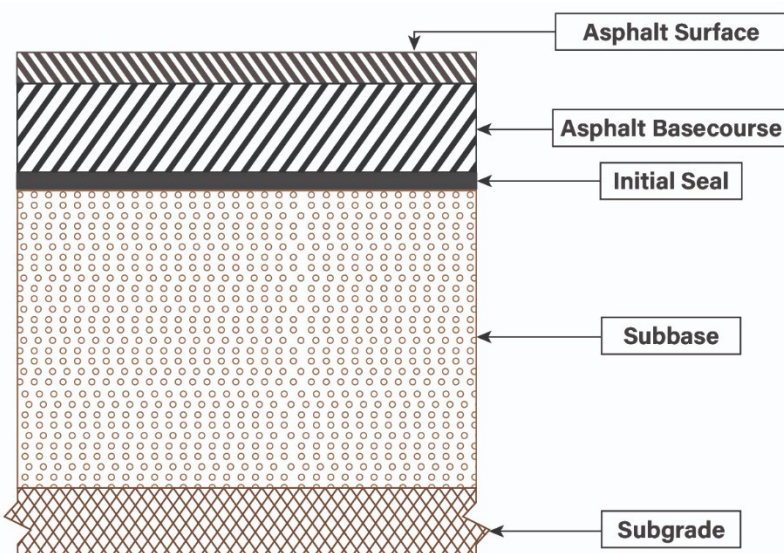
Example pavement structures – asphalt basecourse (see Section 3.1.3)
